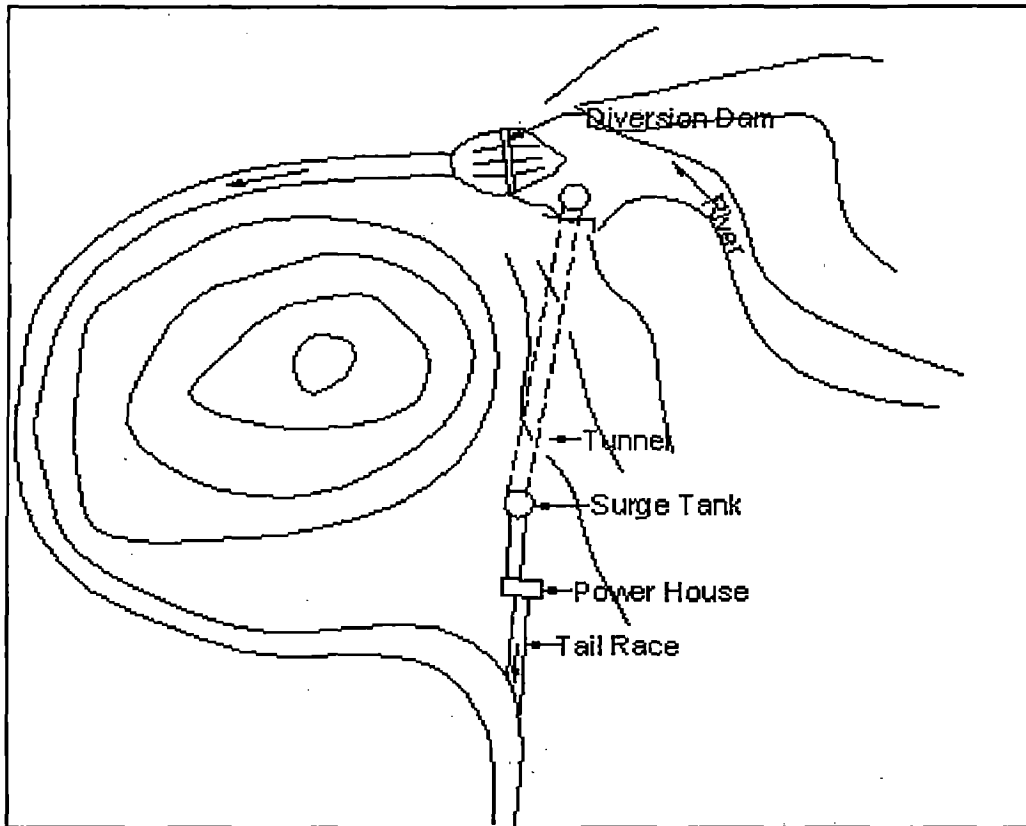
(a) : Typical layout of run-of-river scheme with pondage
